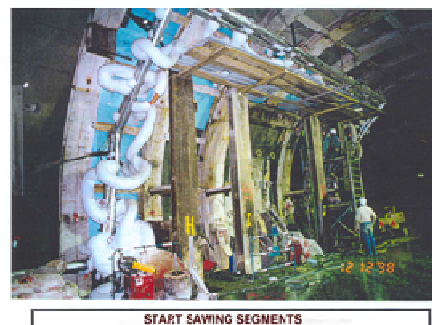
BPNL Tunnel – internal view of the works / vue des travaux de congélation
